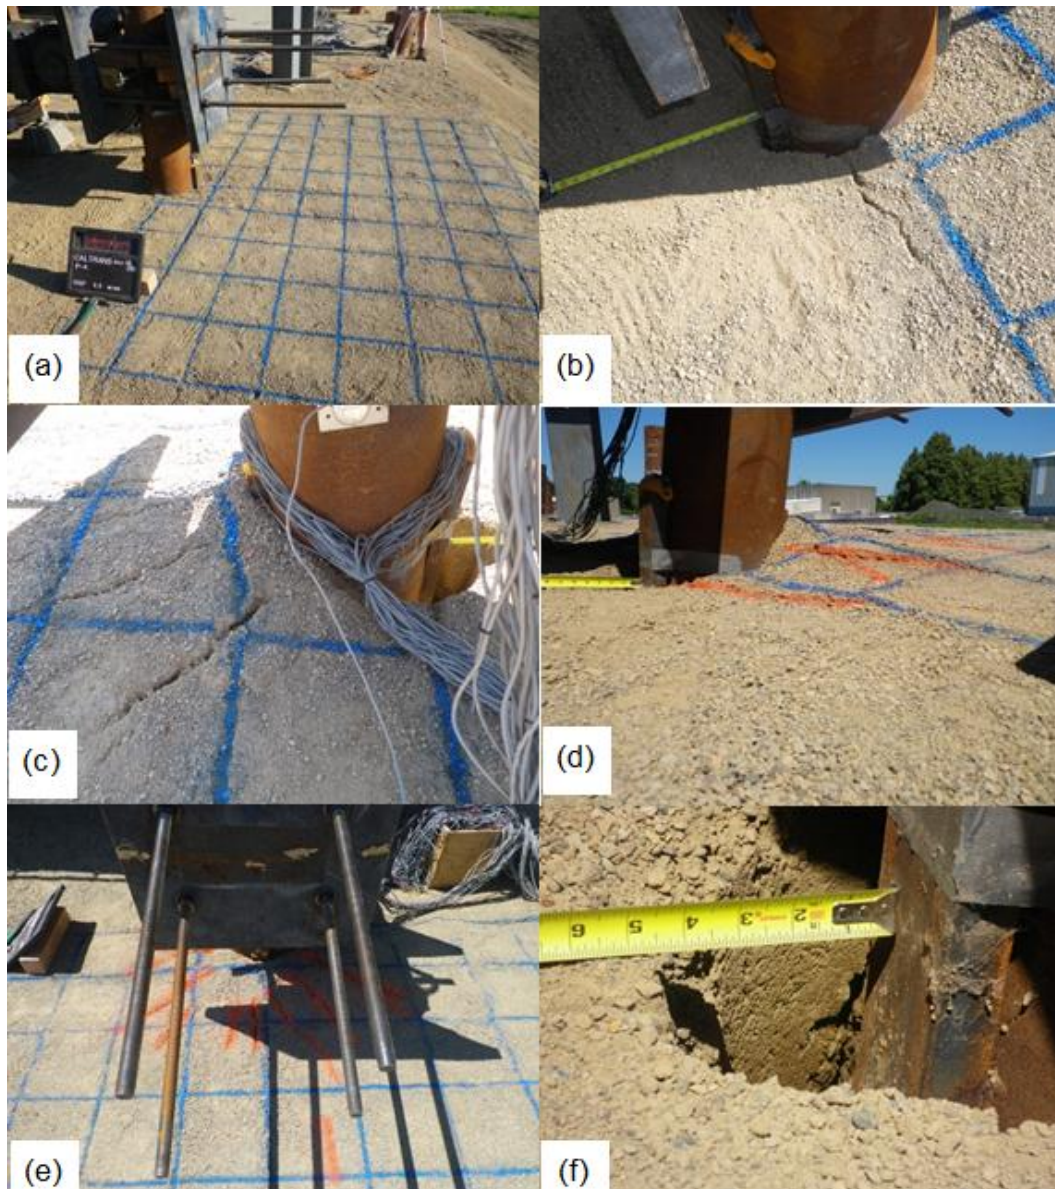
Observations during lateral loading testing of pile P-8 (8D) a) Pile before loading b) Pile at 0.5" of displacement c) Pile at 5.0" of displacement with cracking d) Soil heave at end of testing e) Soil cracking at end of testing f) Gap formation behind pile
